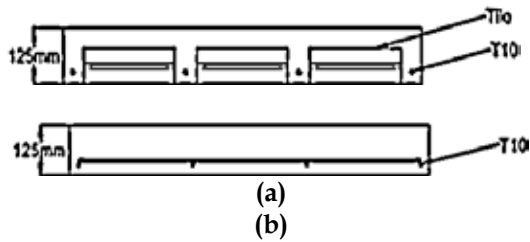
Cross section of filler slab (a) and RC solid slab (b)
